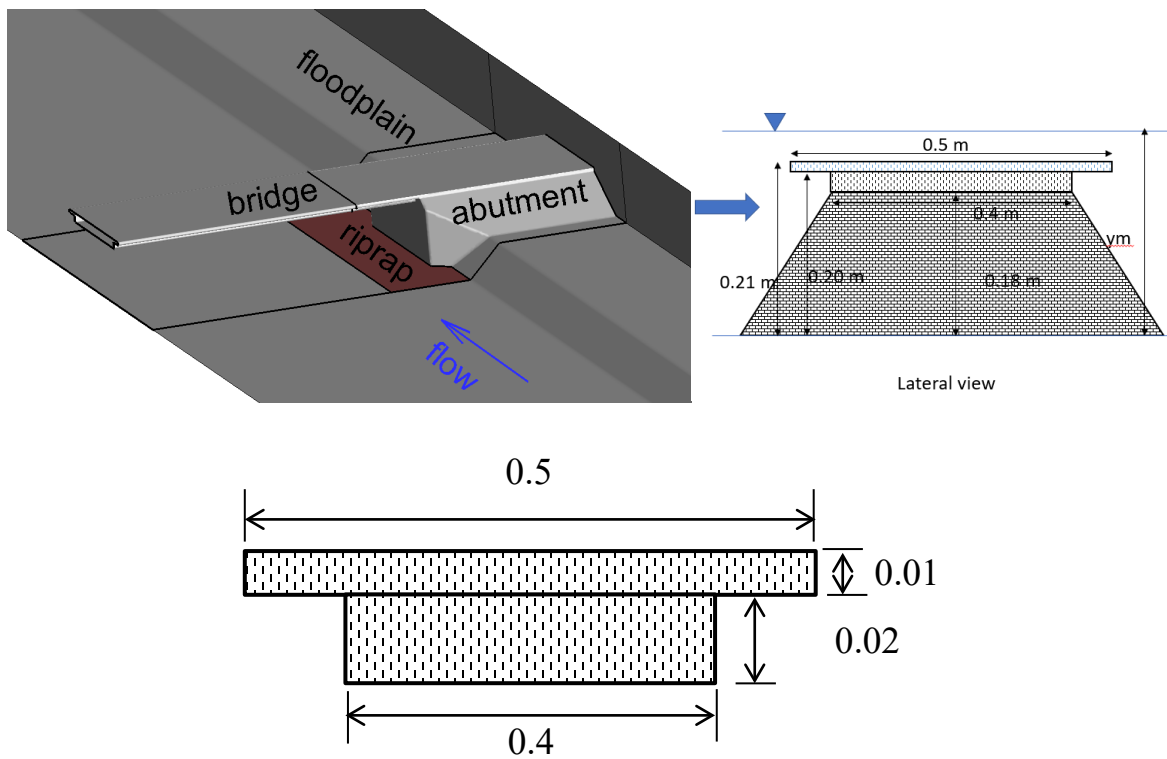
Sketch showing computational domain containign the wing-wall abutment and cross section cutting through the abutment and the bridge deck. Also shown in the bottom frame are the bridge deck and girders dimensions
